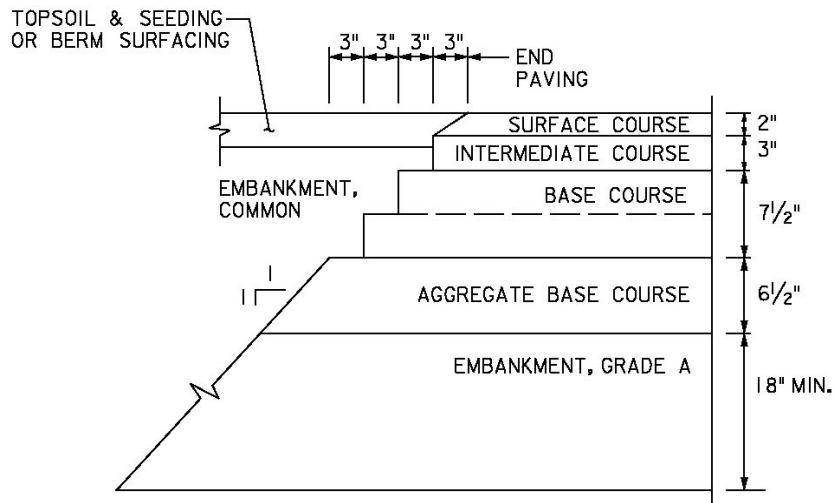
A - 10 PAVEMENT REMOVAL AND RECONSTRUCTION DETAIL
